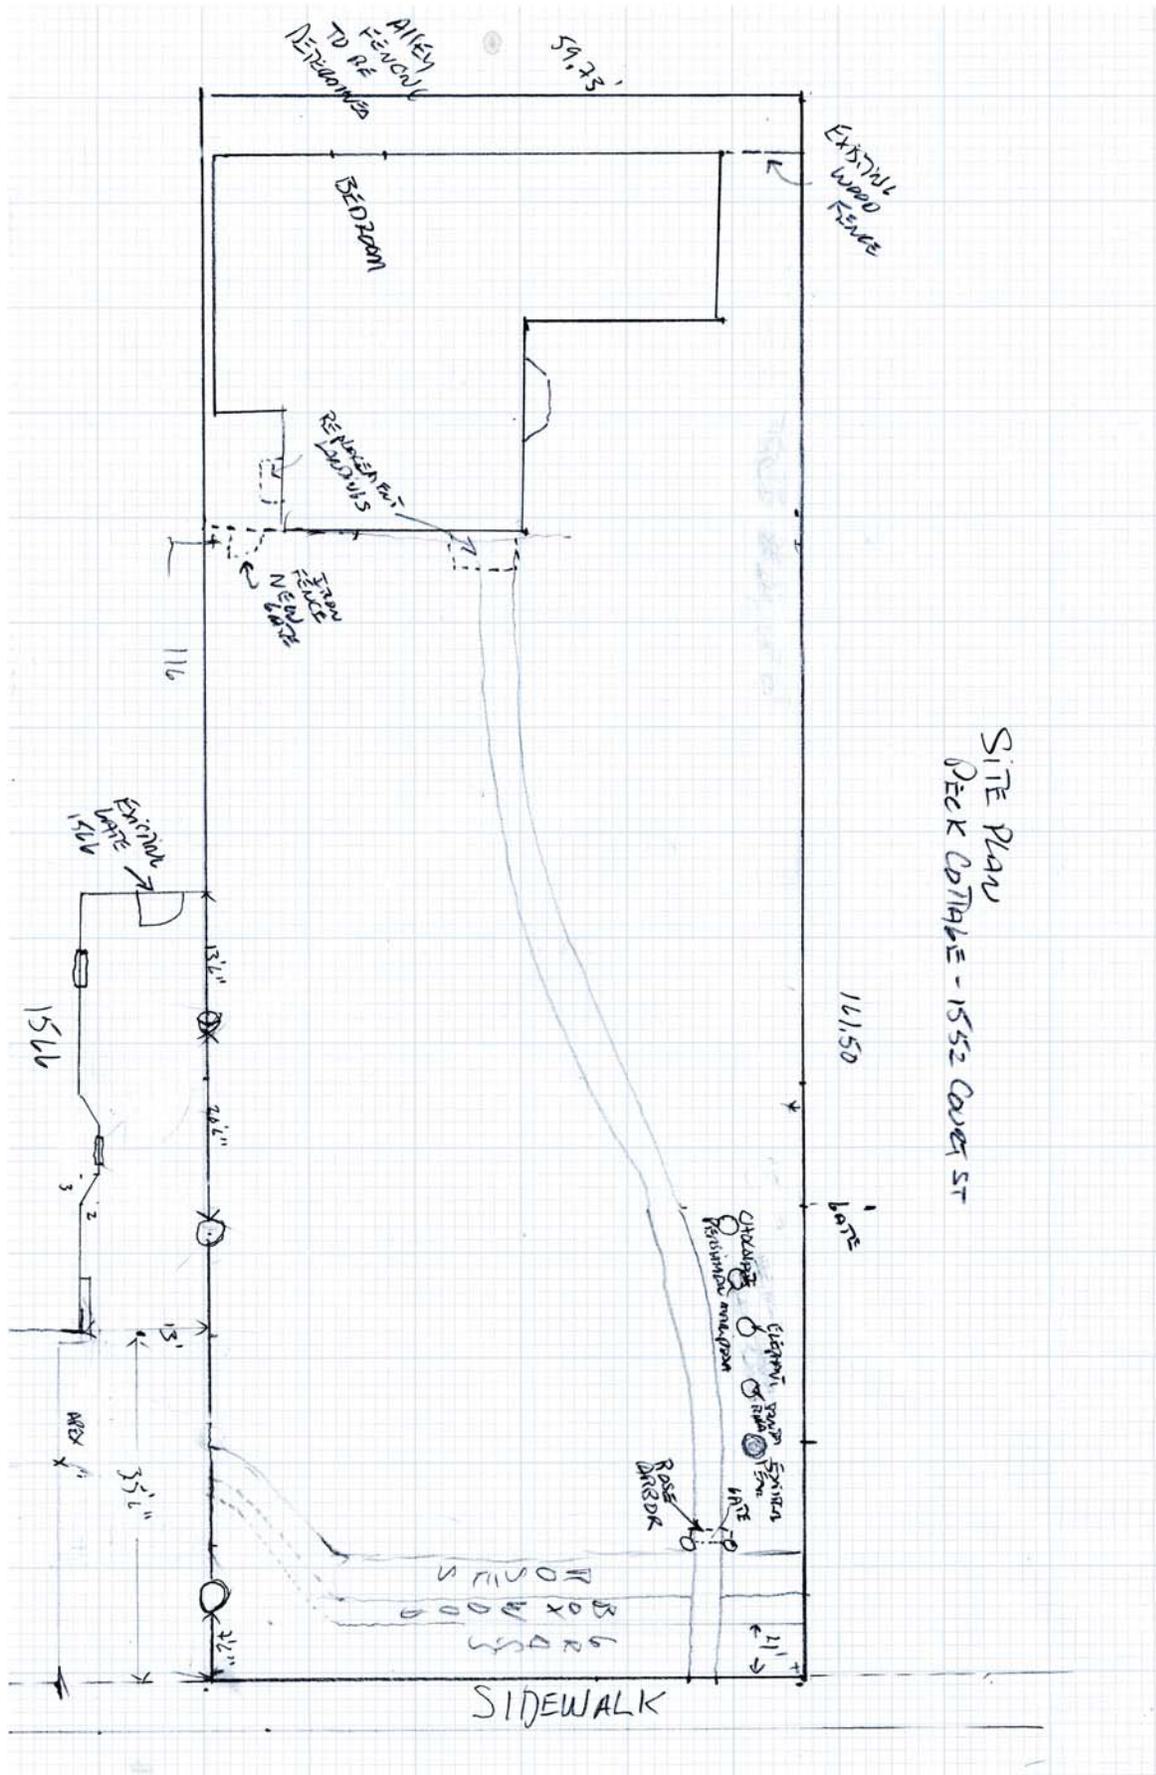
Site Plan For Peck Cottage - 1552 Court Street
